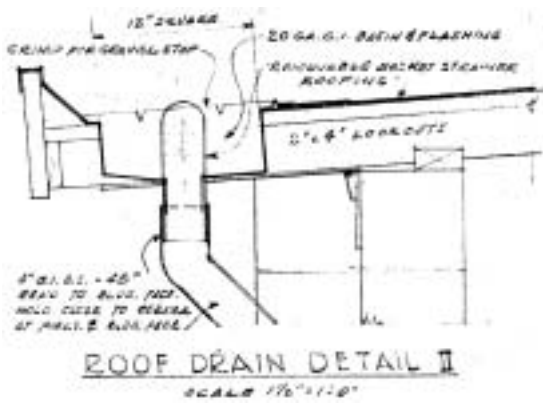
DETAIL OF ROOF FRAMING ON THE RECREATION ROOM. UNDATED DRAWING COURTESY OF THE WASHINGTON MILITARY DEPARTMENT.
